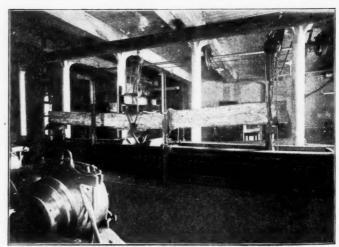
FRONT VIEW OF LARGE TRANSVERSE TESTING MACHINE.
